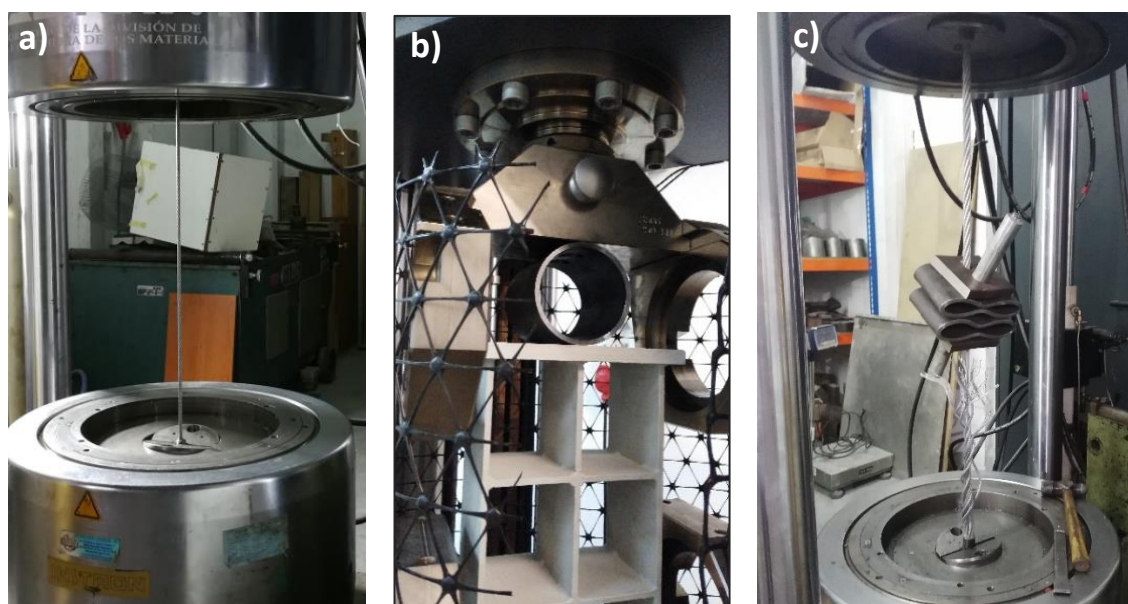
Static tests a) tensile to cable diameter 16 mm, b) tube compression and c) tensile to brake of 2 tubes.
